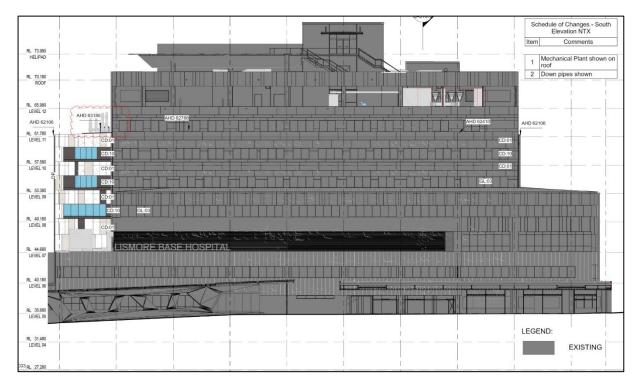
| SSD-8963-Mod-1 Proposed south elevation (Base source: SSD-8963-Mod-1)
